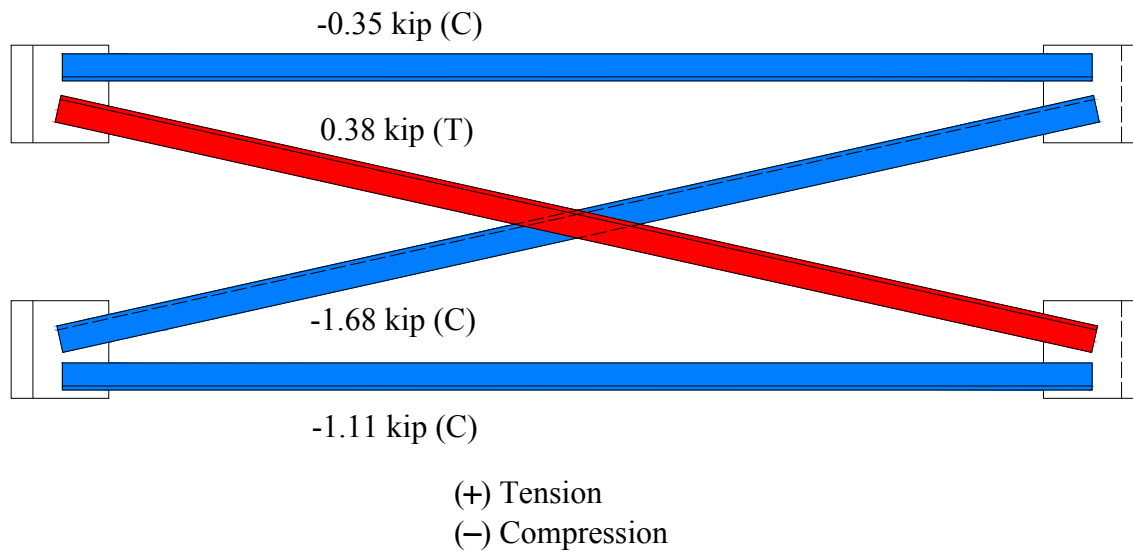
End Cross Frame Forces due to Concrete Deck Placement
